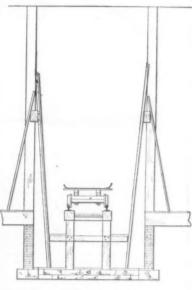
Section of Iron Pit.—Scale, 4 Feet to Inch.
